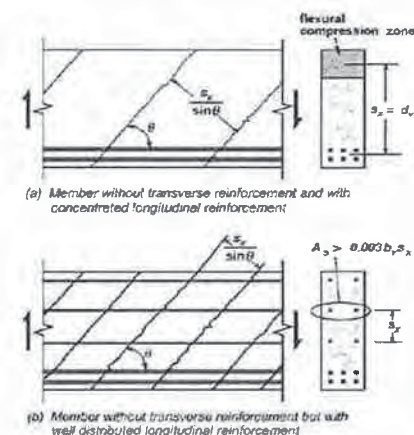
Definition of Crack Spacing Parameter, s_x
